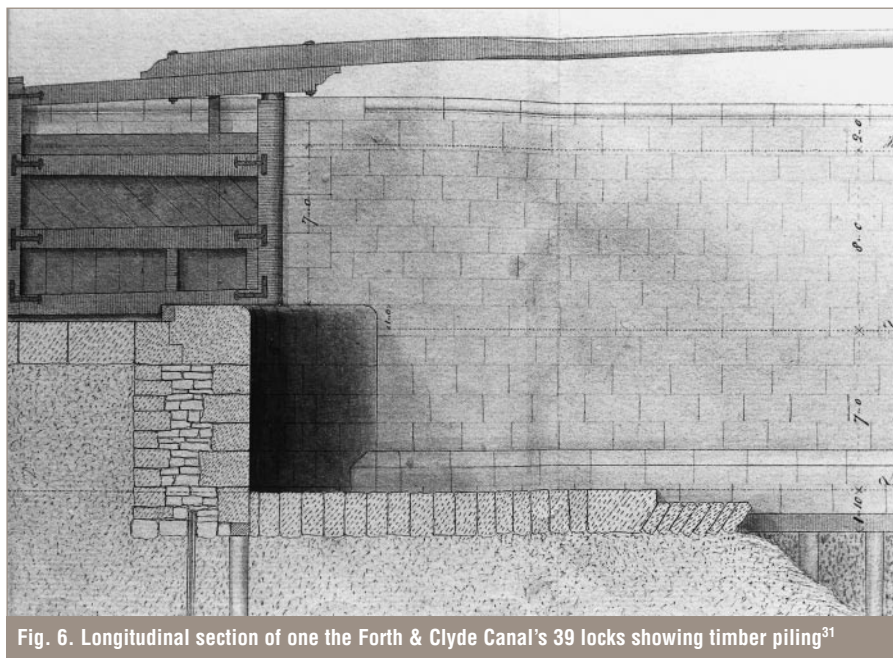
Longitudinal section of one of the Forth & Clyde Canal's 39 locks showing timber piling<sup>31</sup>
